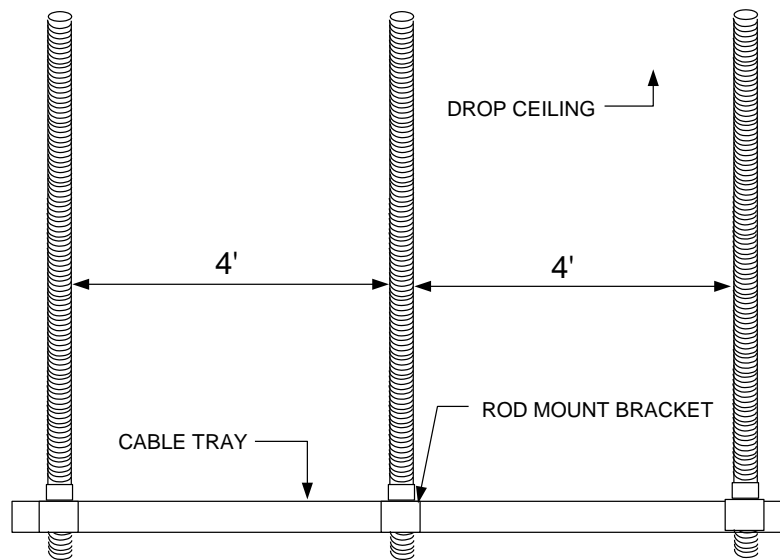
Side View of Cable Tray with Rod Mount Brackets
